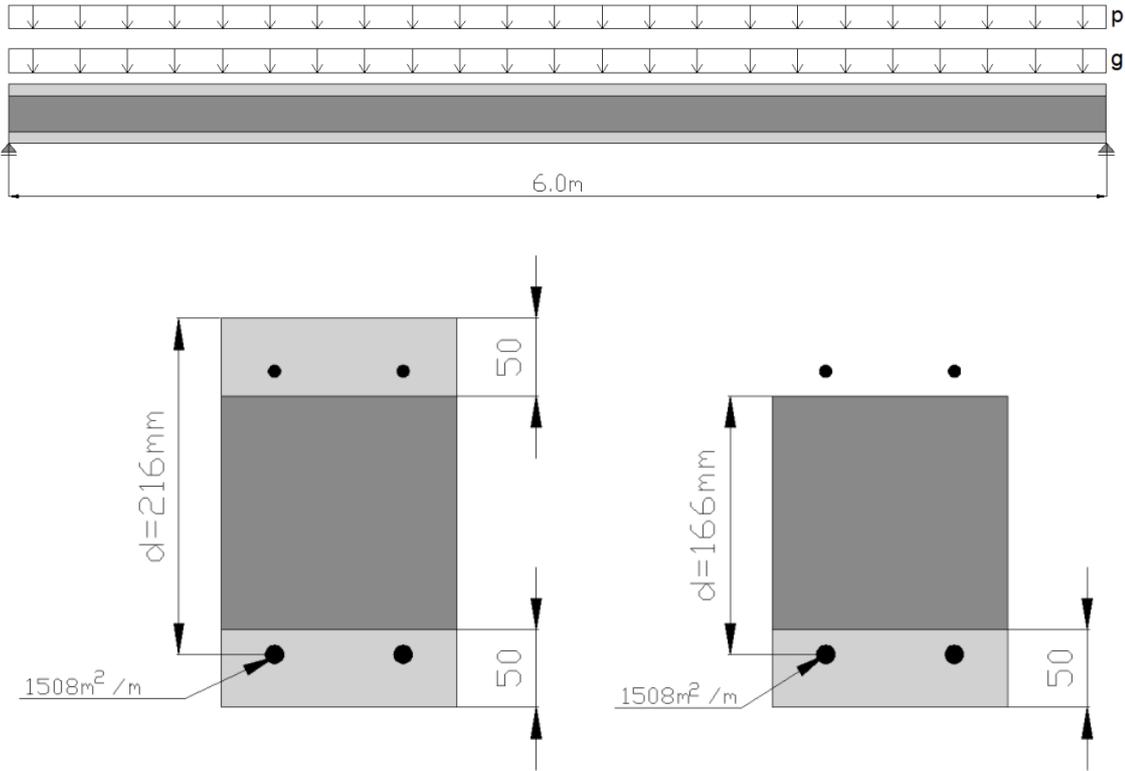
Sketch of measures and loading for simple supported beam used in the example. Cross sections are assumed to have unit length of 1m.
